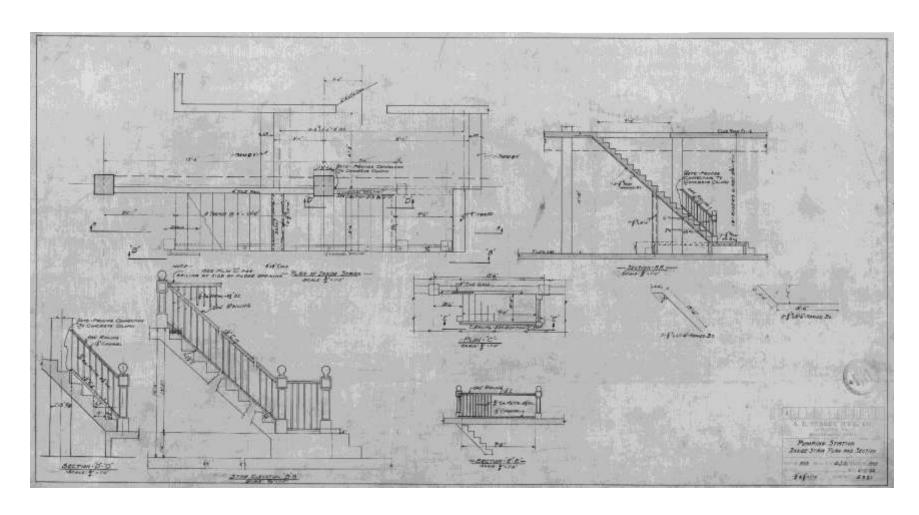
Pumping Station, Inside Stair Plan and Section* (AES, Drawing No. 5321, 11 June 1920; see also Drawing No. 4345 for sectional view). This image depicts the redesigned, as-built stairs.
